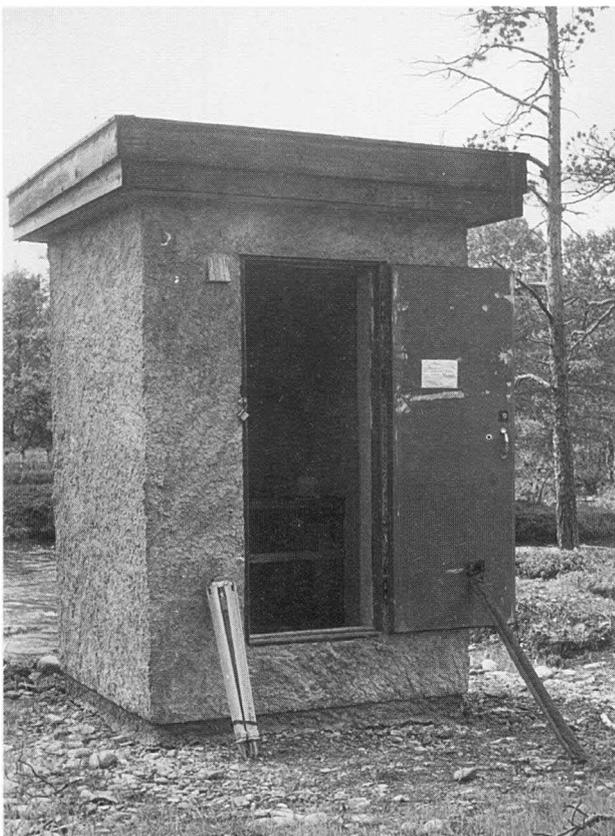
House for water-level recorder. Stilling well set in river bank, house made of plastered porous concrete blocks (Rinna River at Rinna Dam, Norway).
